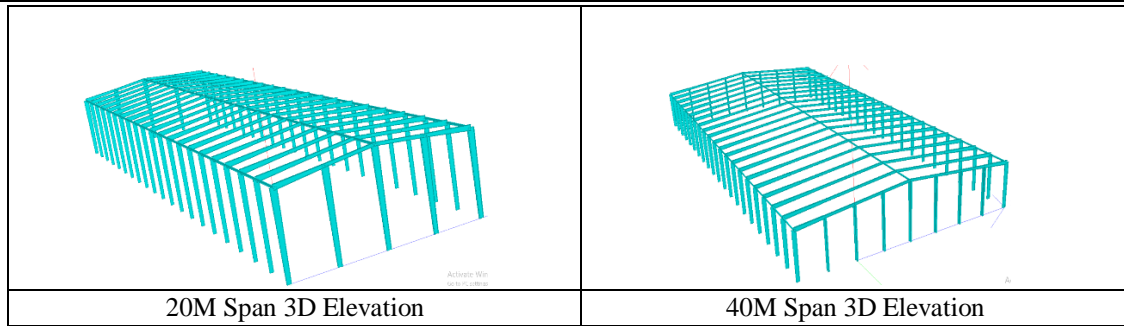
Section geometries of Pre-engineered building warehouse. (All dimensions are in m)
